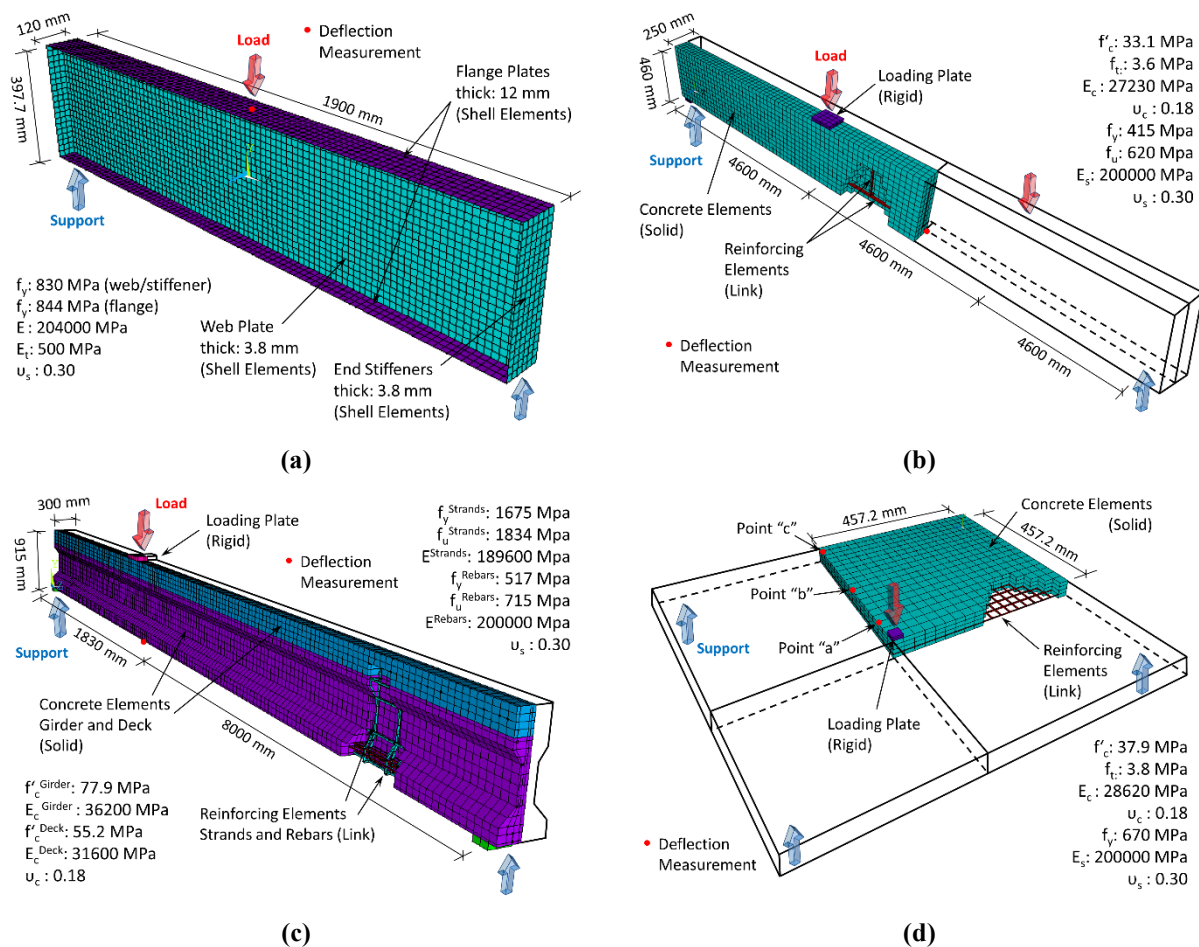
Intact element-level FE model development (a) steel girder (b) reinforced concrete beam (c) prestressed concrete girder (d) reinforced concrete slab
